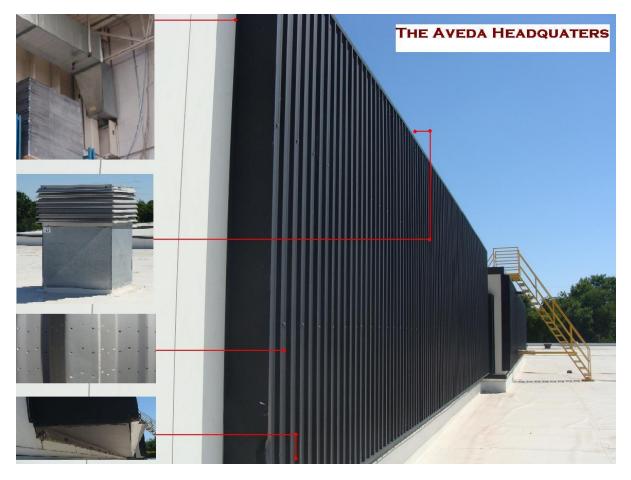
Breakdown of AVEDA solar wall components.
